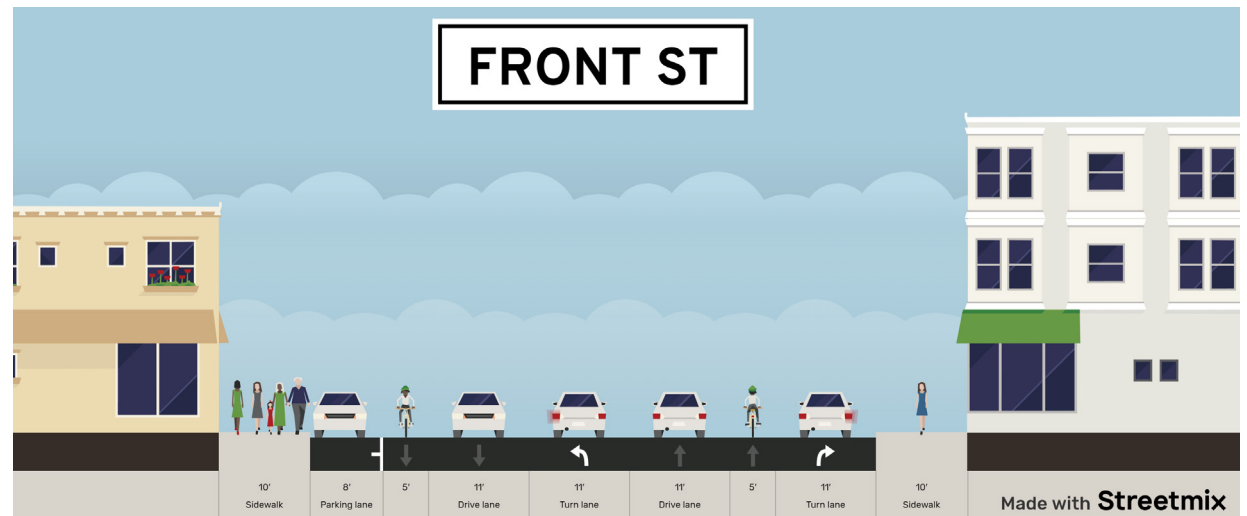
Proposed Front Street Layout (facing north from Liberty Street)
